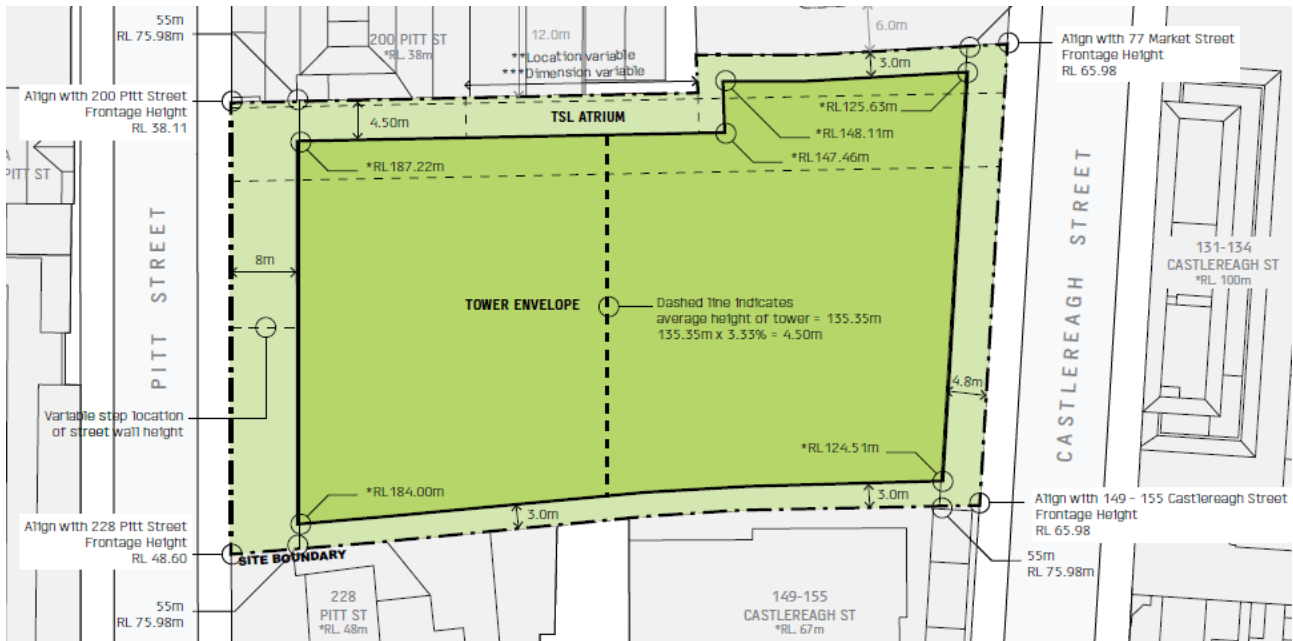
XX 133-145 Castlereagh Street, Sydney – planning envelope – setbacks
